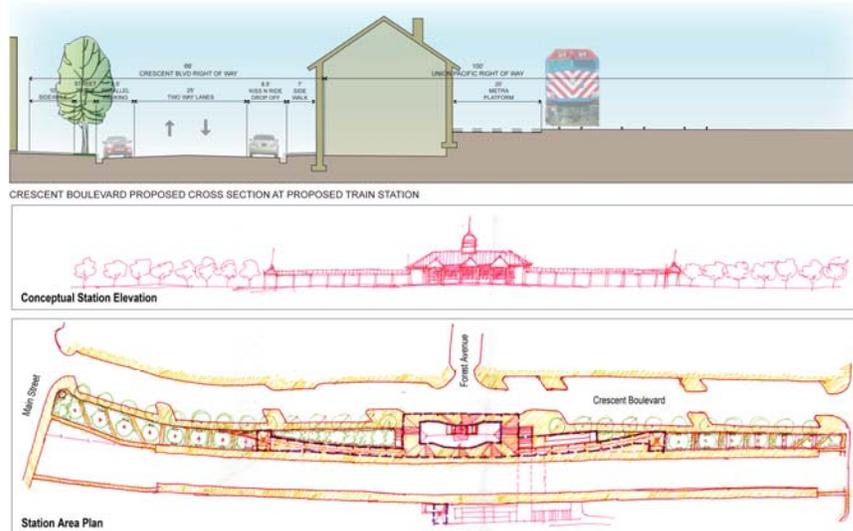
New Glen Ellyn Train Station Cross-Section, Concept Elevation, and Concept Plan
